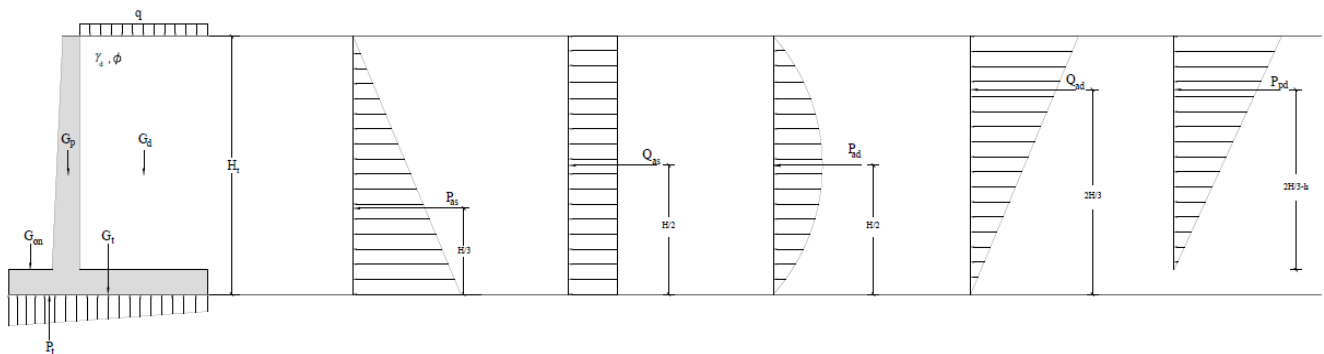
Static and dynamic loads that can affect a cantilever retaining wall.
